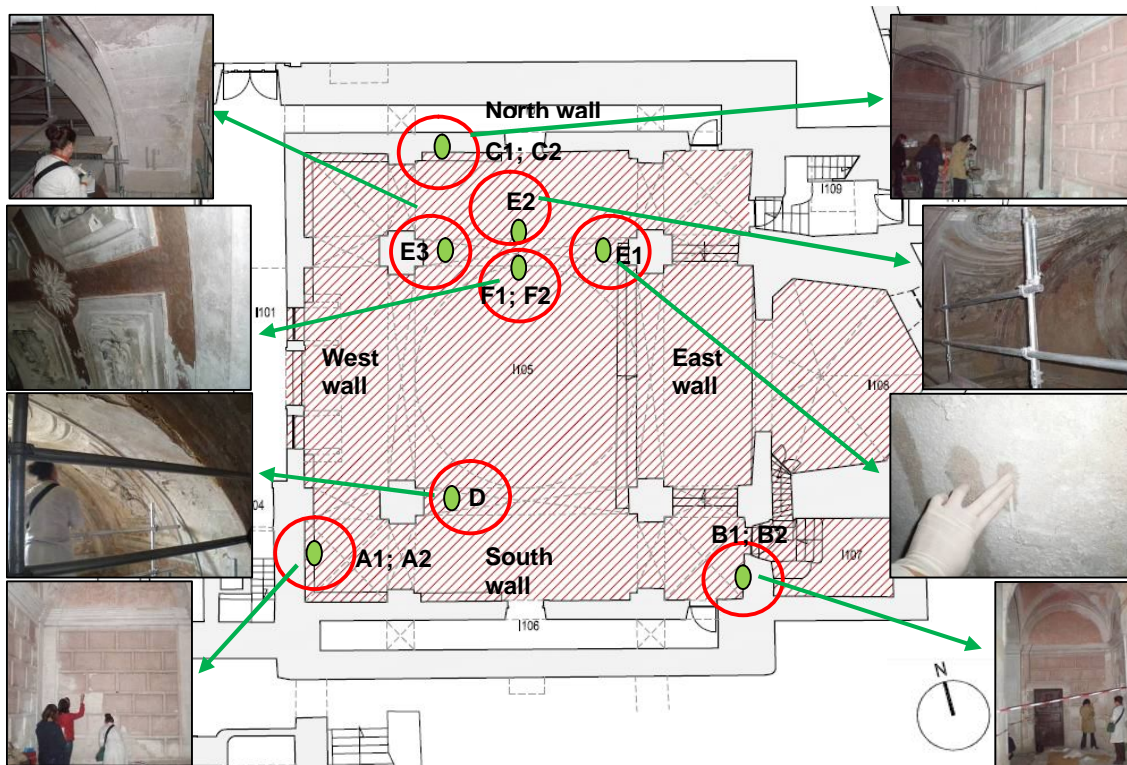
In situ tests localization in the plan – Santissimo Sacramento Church
